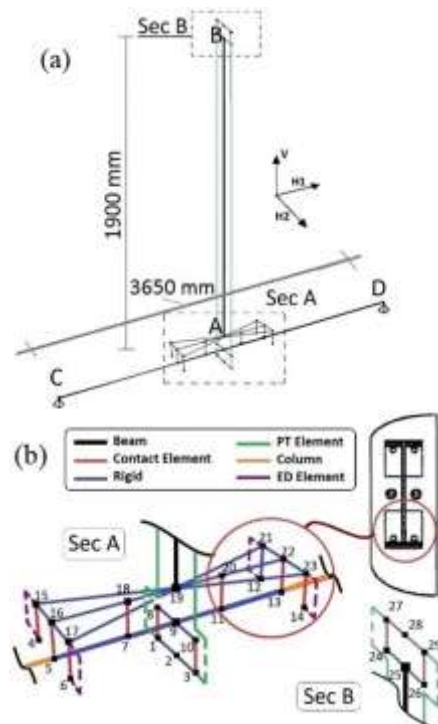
Overview of beam-column modeling with PTED connection (a) and details of the A and B sections (b)
